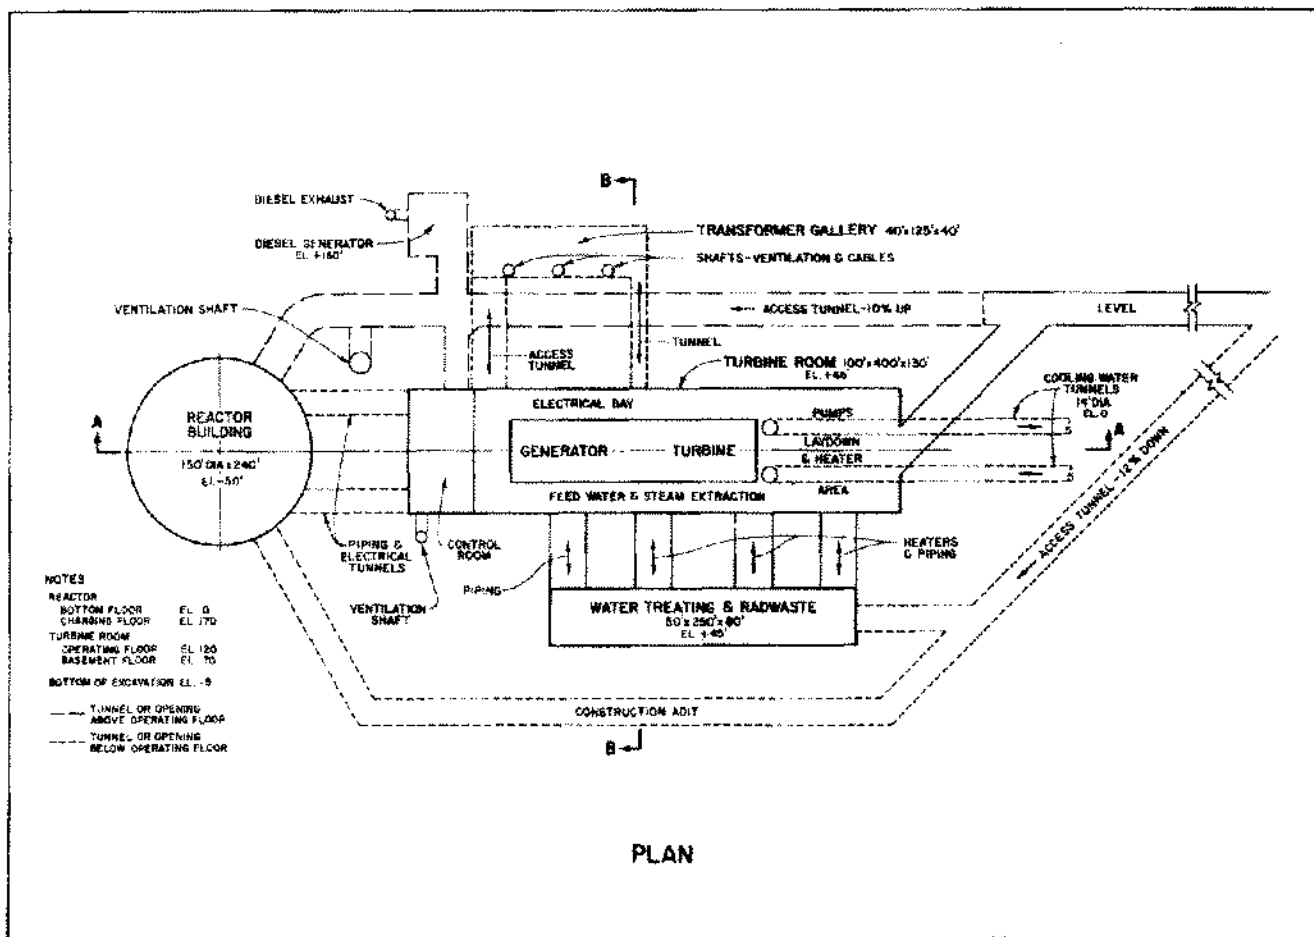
Plan view of a proposed underground nuclear power plant. From Swiger (1971).
